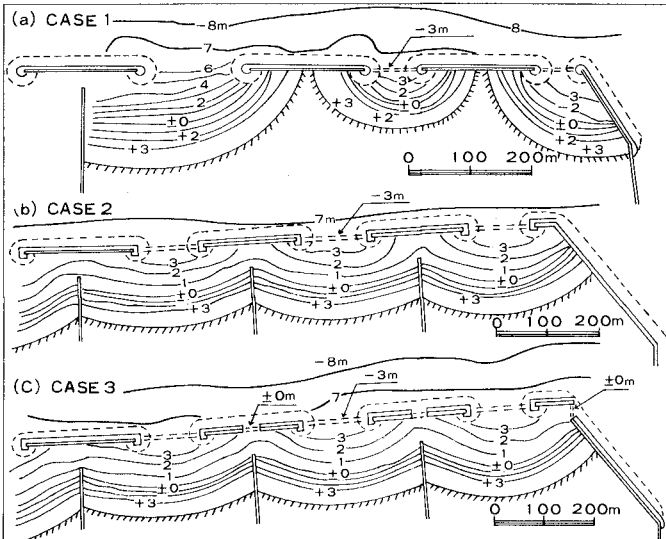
Typical layouts of the artificial beach tested for the west portion
